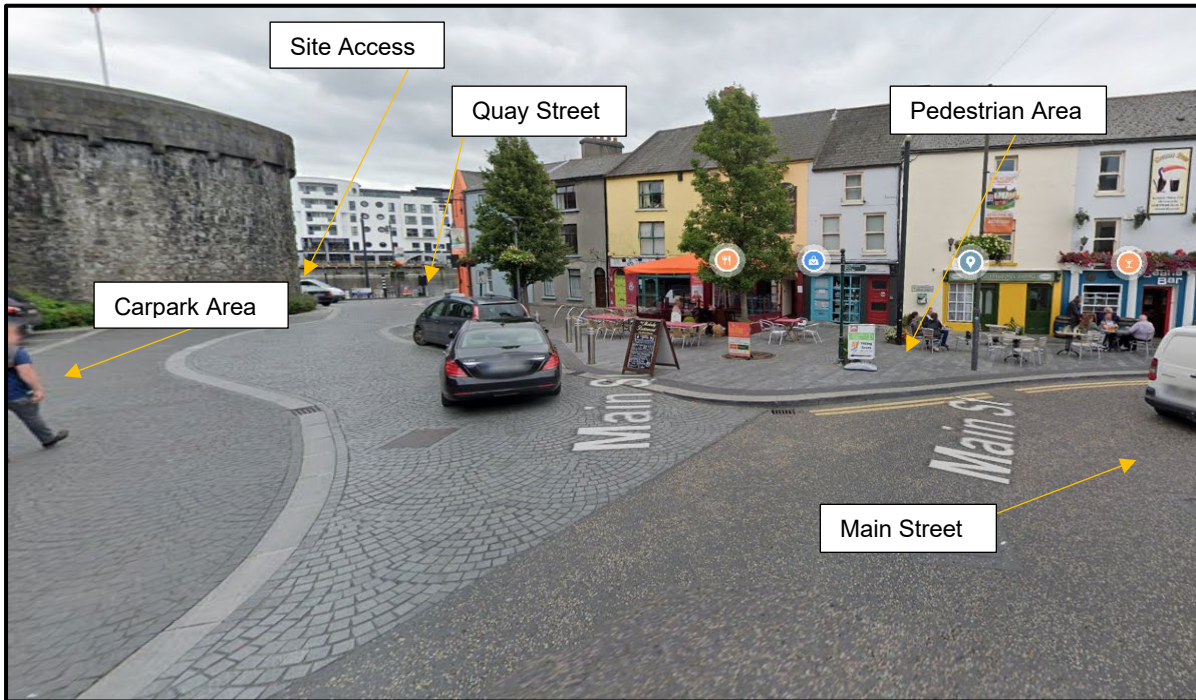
Access Road off Castle Street Leading to the Proposed Work Site (Source: Google Maps)
